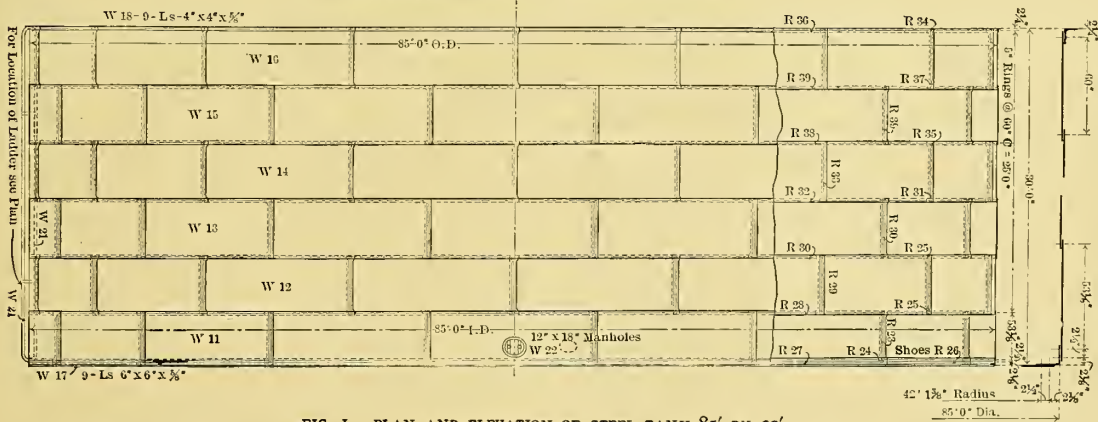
PLAN AND ELEVATION OF STEEL TANK 85' BY 30'.
